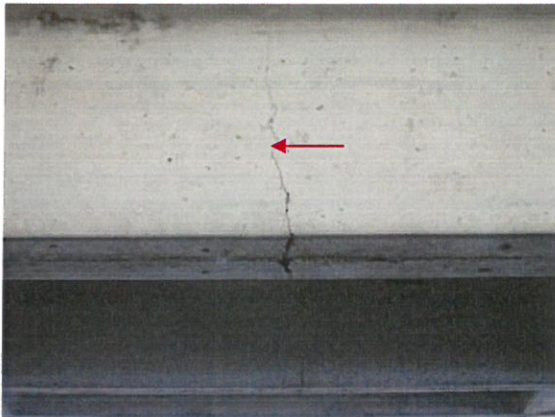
Crack in joist typical on the underside of the roof level
